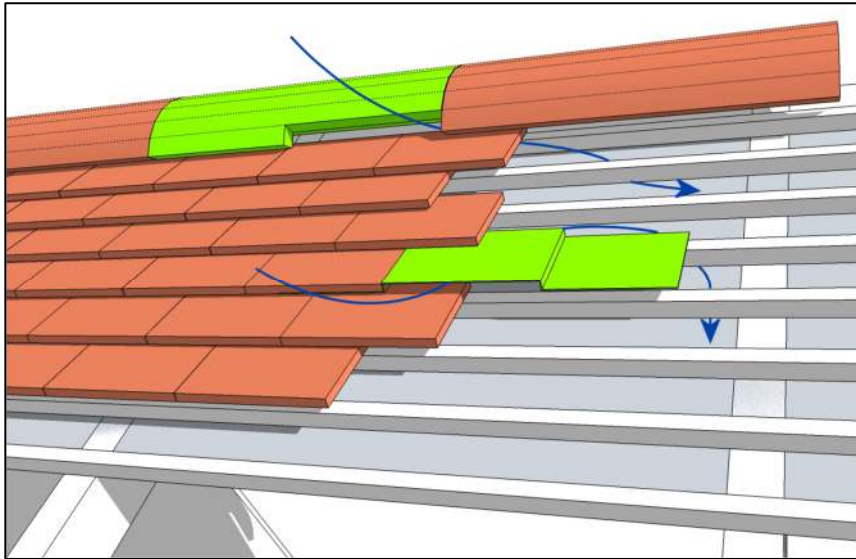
Access into the roof void via a lead saddle or a modified ridge tile.
